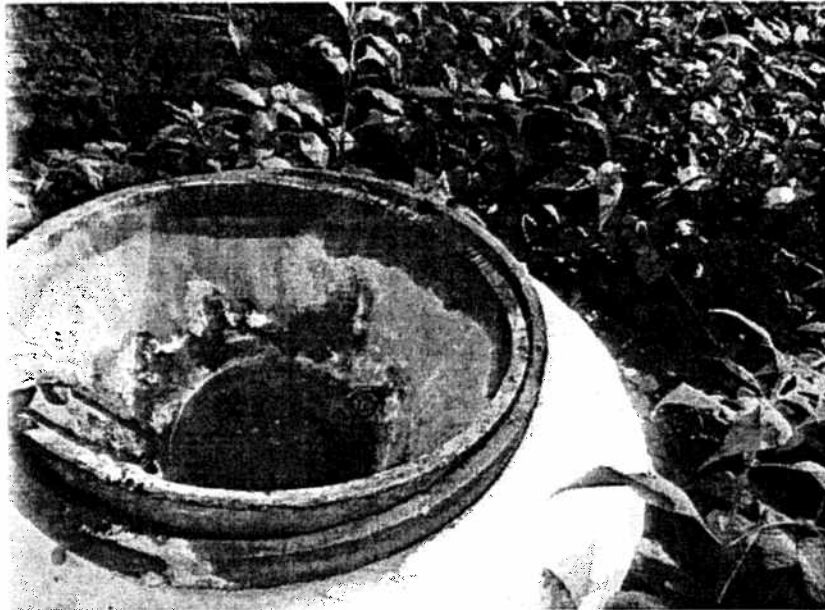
Charlestown Road Sewer Surcharge - View of surcharged manhole.
